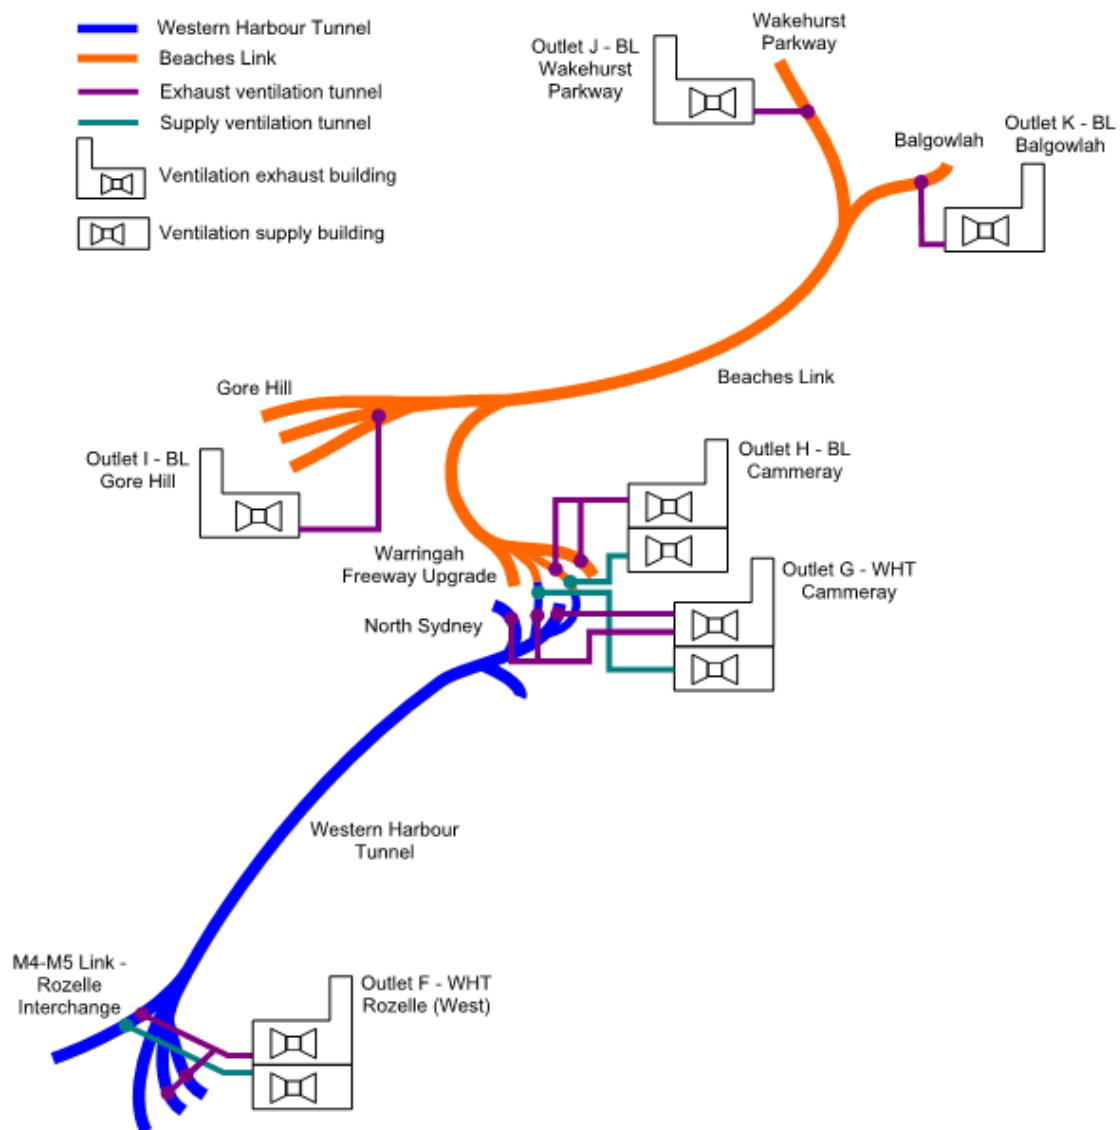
Tunnel ventilation system overview of Western Harbour Tunnel and Beaches Link
